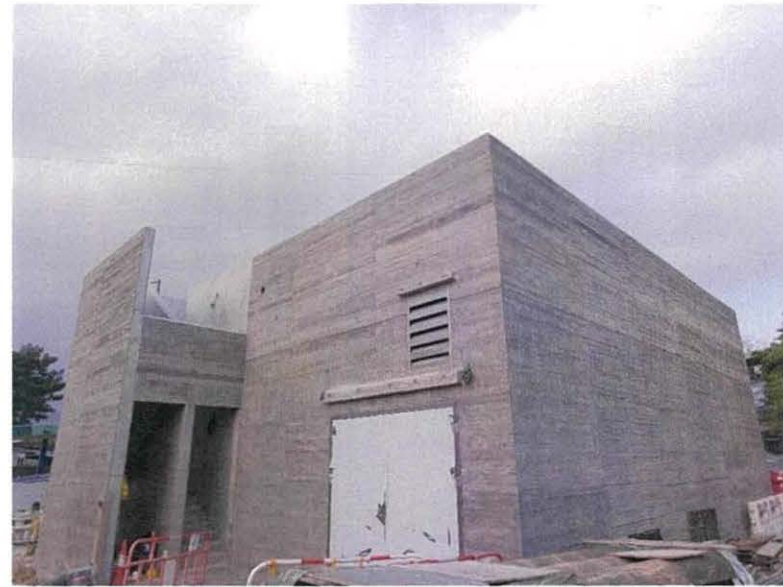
Silencer at outlet of extraction fan and Soundproof Door
